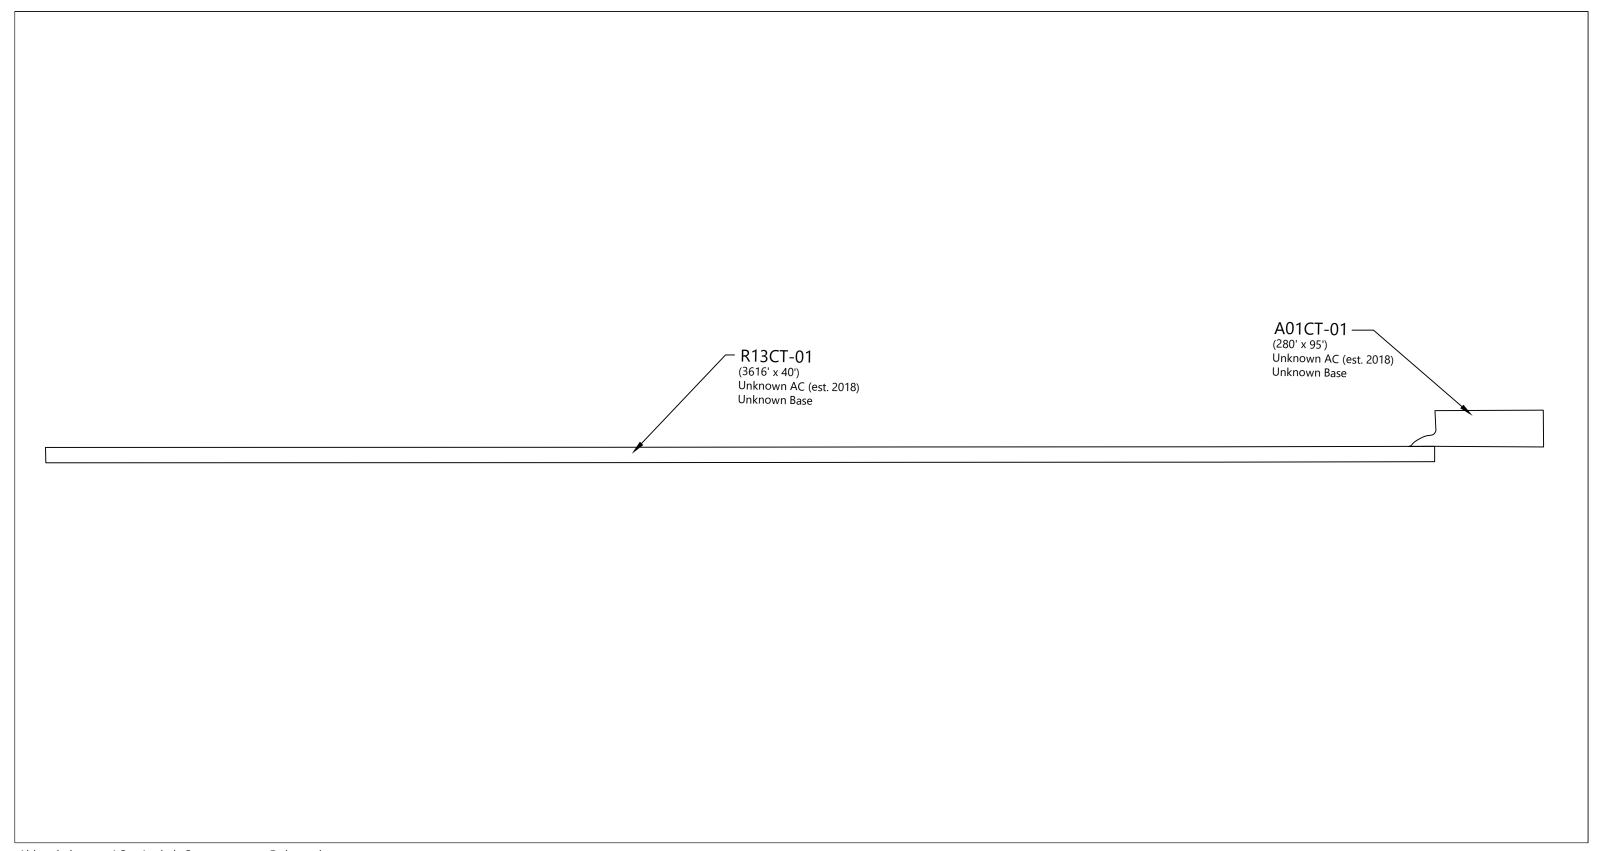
CRESCENT LAKE AIRPORT PAVEMENT AREA BY BRANCH USE
